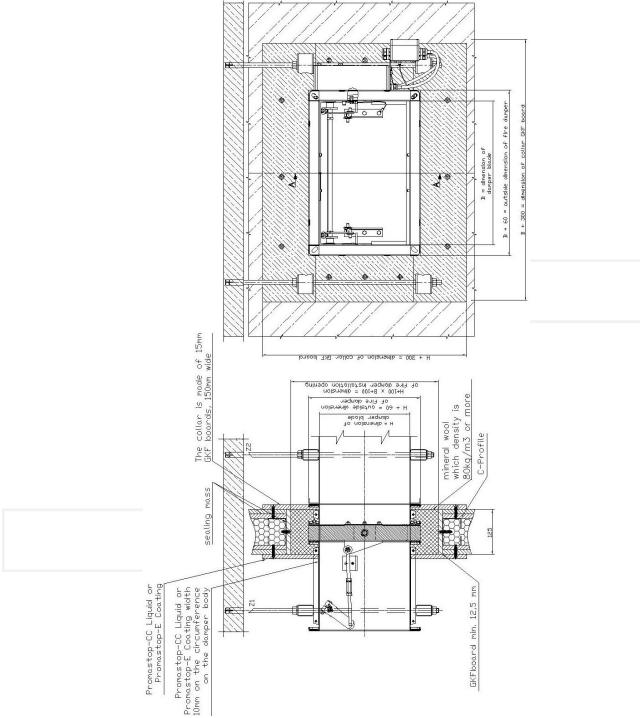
Installation method of fire dampers KWP-O in flexible wall
